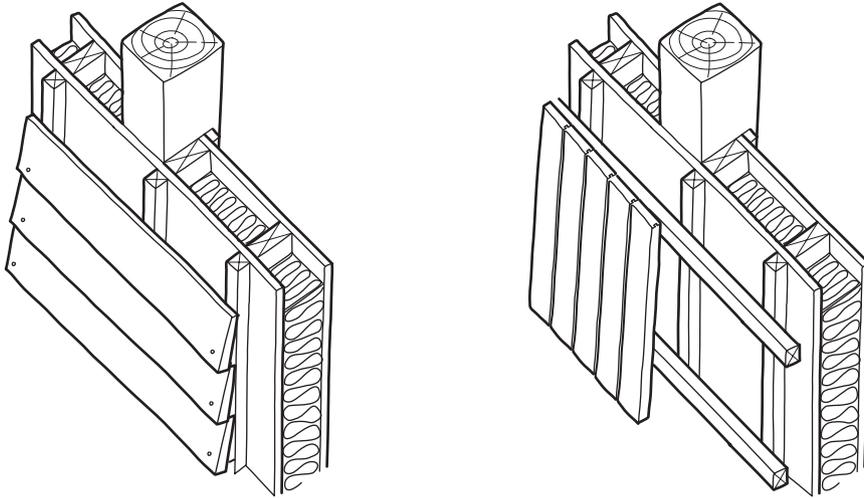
Drained and vented cavities. Left Horizontal lapped timber boarding supported on vertical battens,
